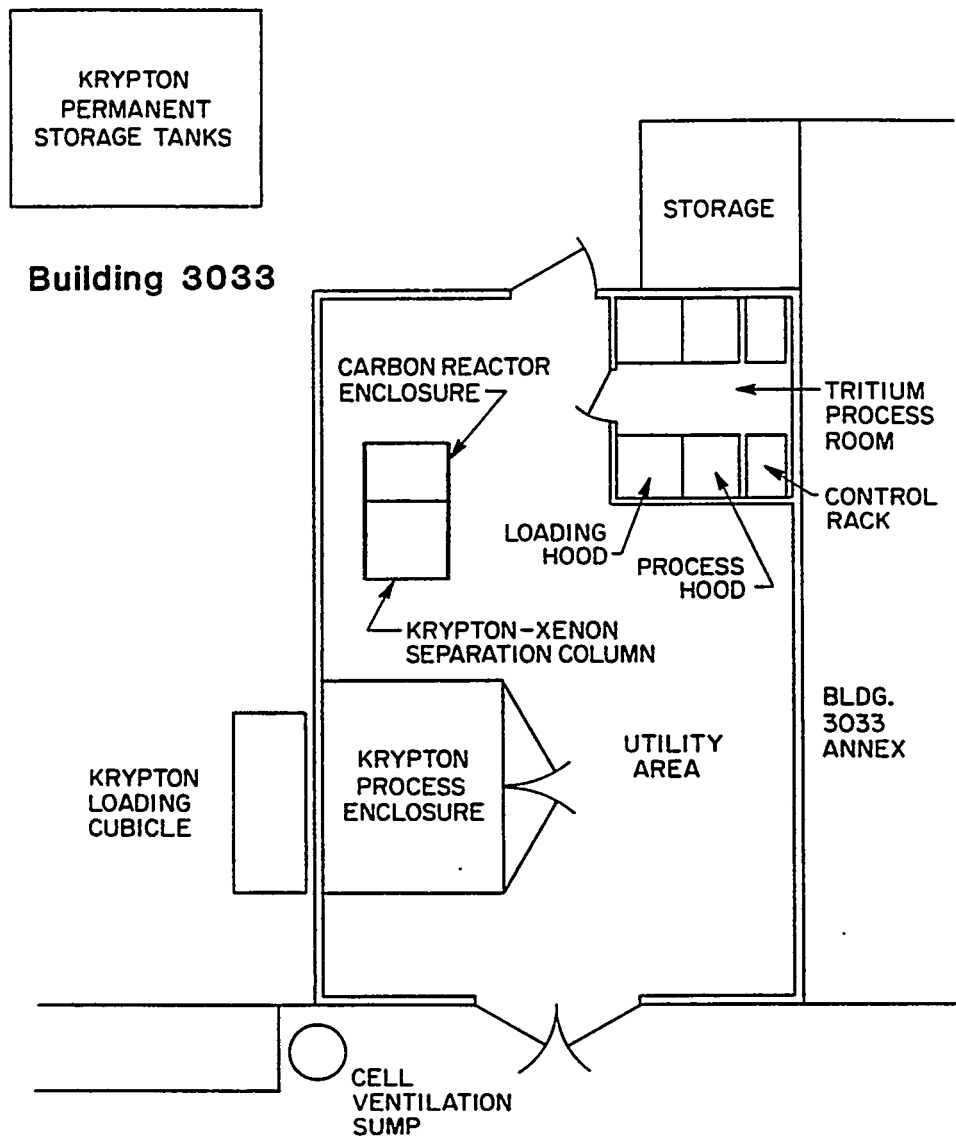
Floor plan of Building 3033—Tritium and Krypton Production Facility.
